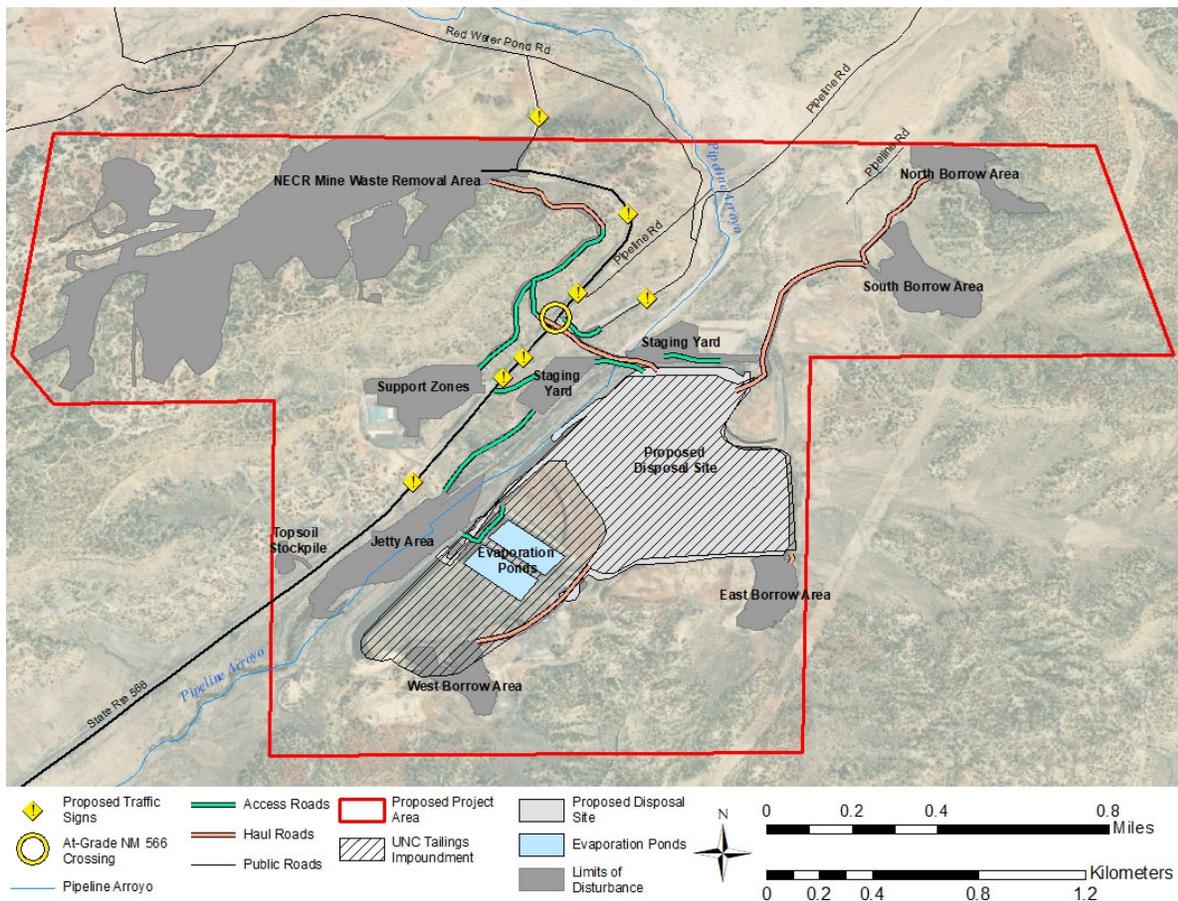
Proposed Project Area Access and Haul Roads
